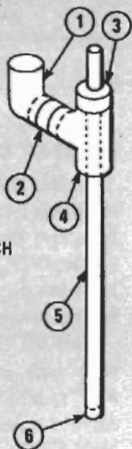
USE THIS SETUP to place the water-temperature sensor. With it, temperature readings will be accurate, and normal boiler operation will be maintained.
